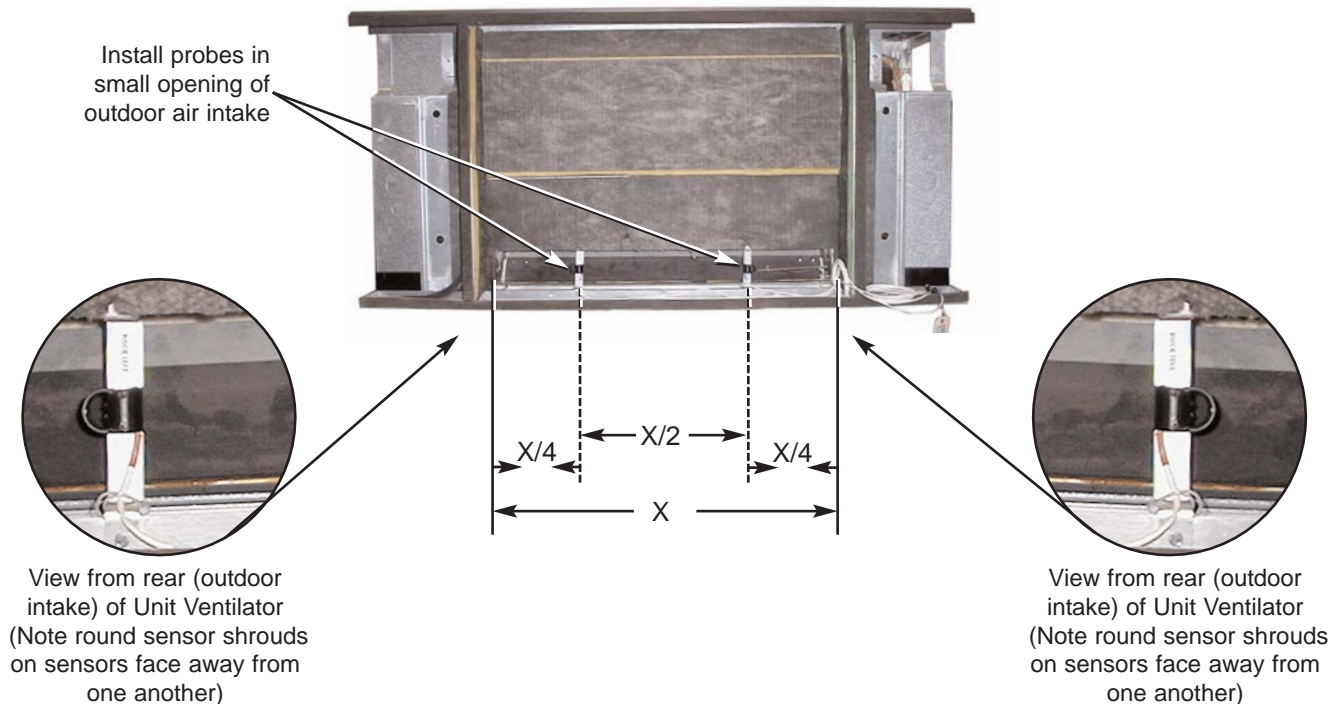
STx104-U Unit Ventilator Sensor Probe Minimum Placement Guidelines
